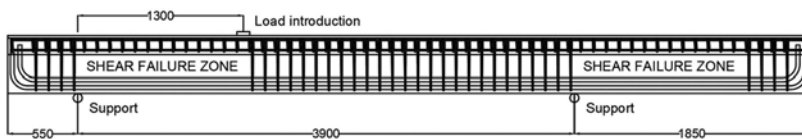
Geometry of the beam specimens (modified from Rossi et al. 2022).
